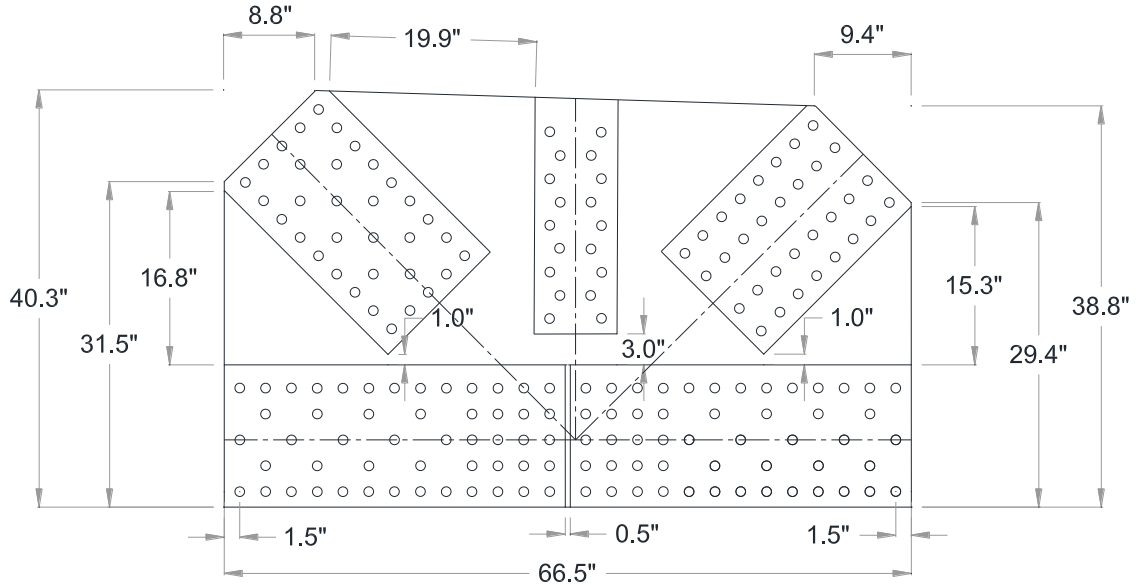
GP307-LS3 specimen gusset plate dimensions
